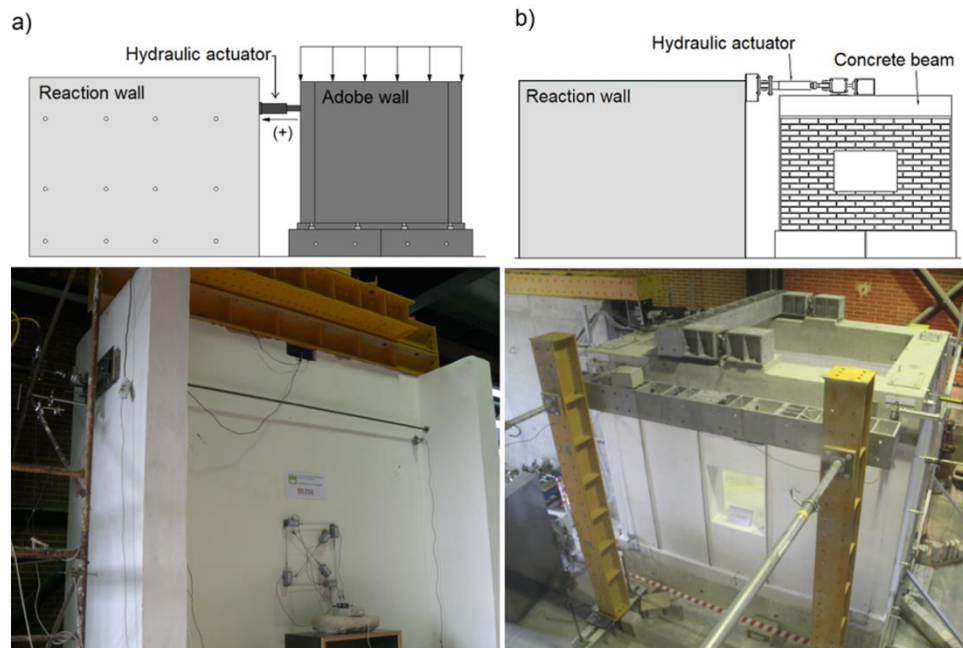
Test setups for: (a) double-T shaped adobe wall (adapted from Silveira et al. (2018)); (b) adobe house model (Varum et al. 2018)
